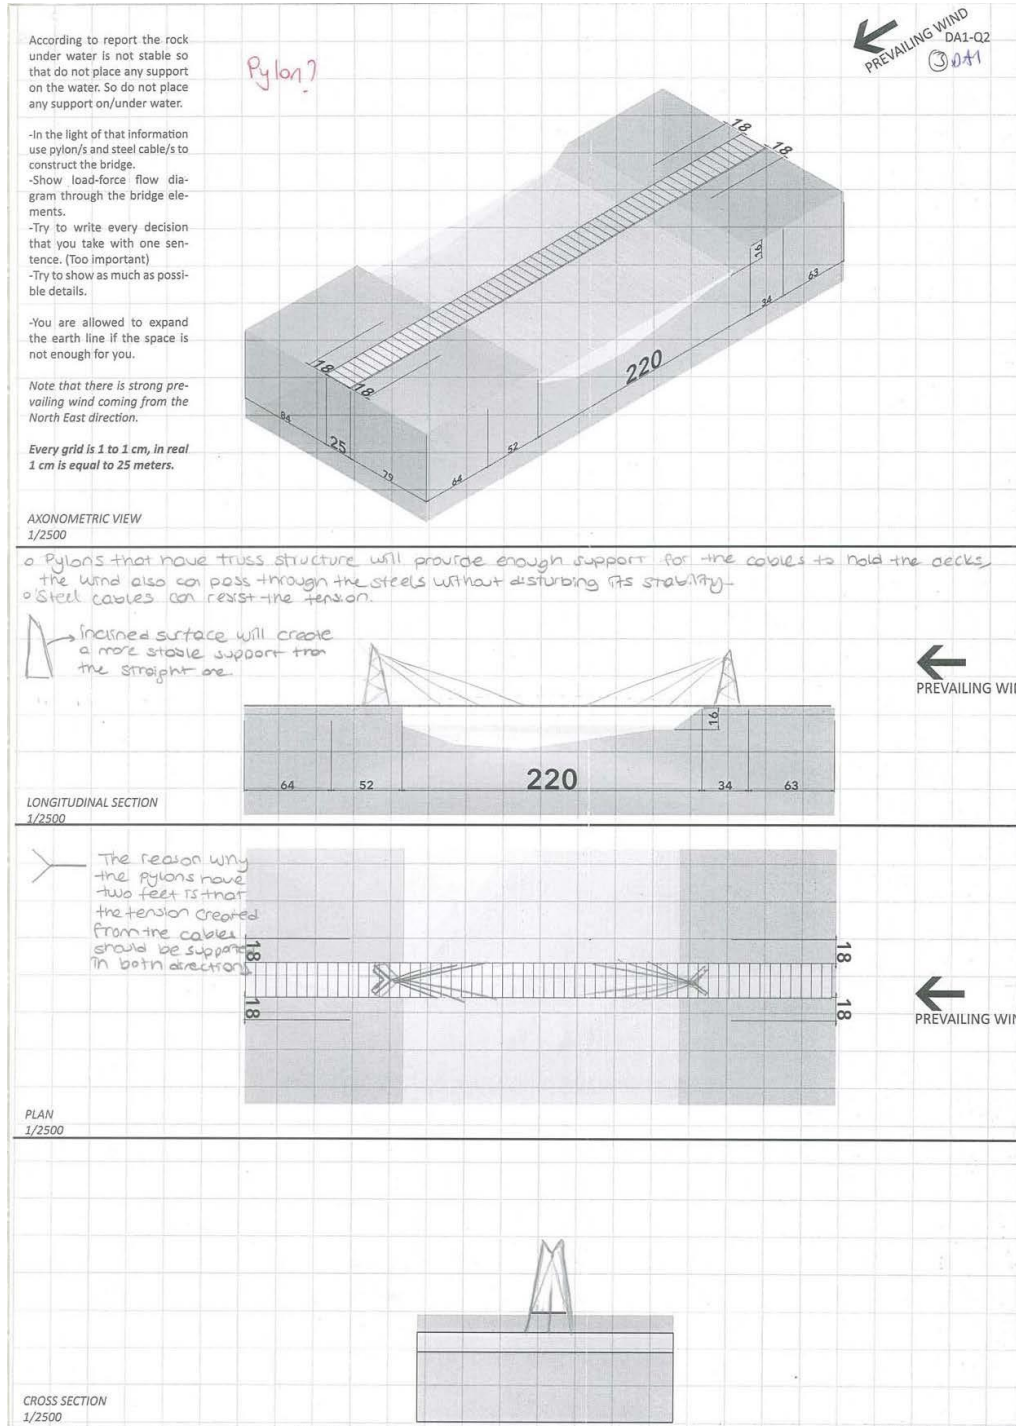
Participant 3 DA-1 Shorter-Span Bridge Question
